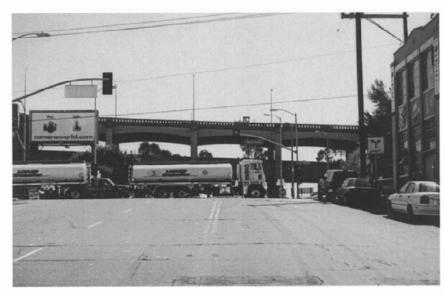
A First Street, Near Harrison Street, Looking South to Elevated Bay Bridge Approach
